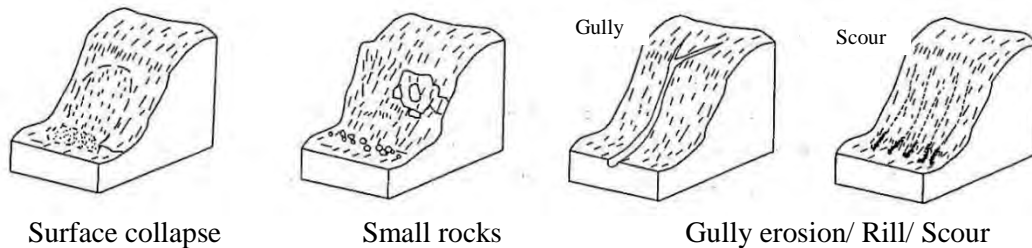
Typical Deformation of Slope Failure/Rockfall
